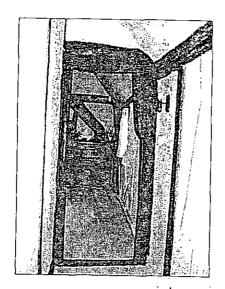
Southern end of landing, jowled post and doorway through to room 15.
